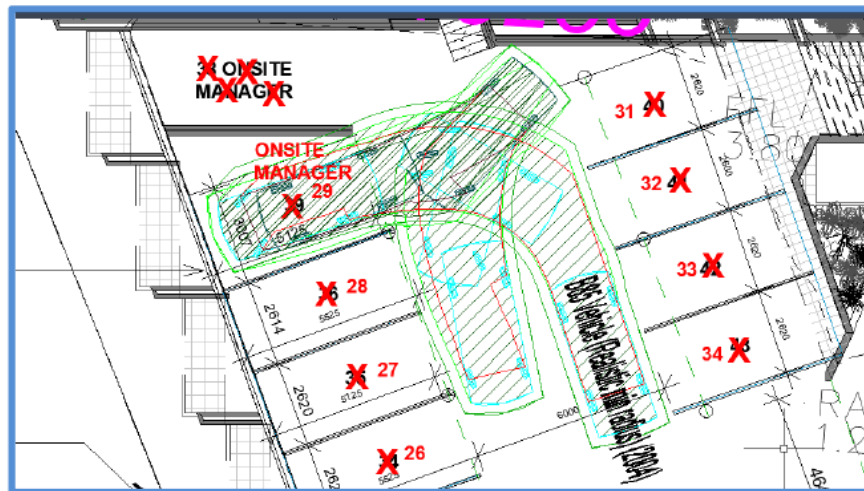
SWEPT TURNPATH ASSESSMENT (PROPOSED ON SITE MANAGER'S SPACE)
